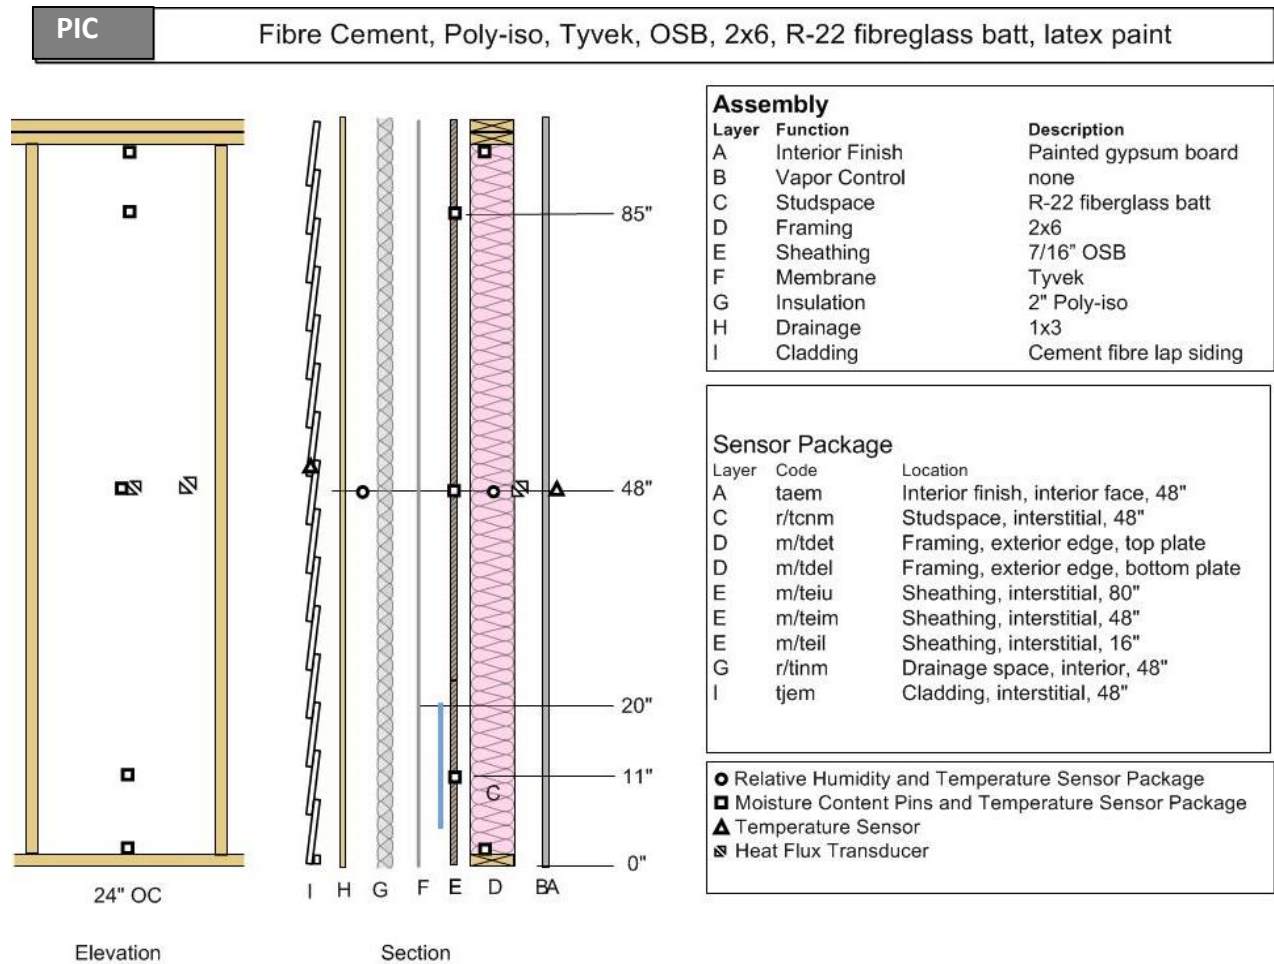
Elevation and exploded vertical cross-section of the center bay of the PIC wall panel
